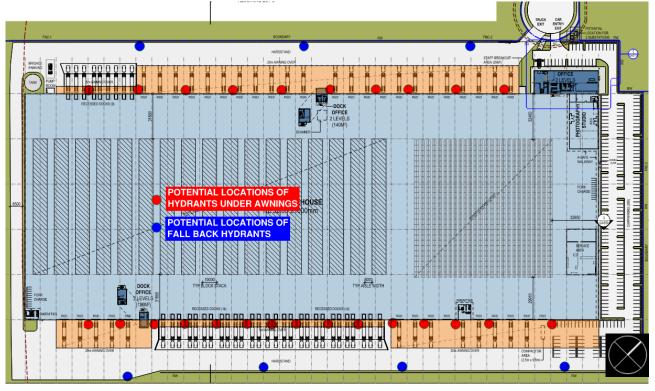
Potential locations of external hydrants and fall back hydrants
